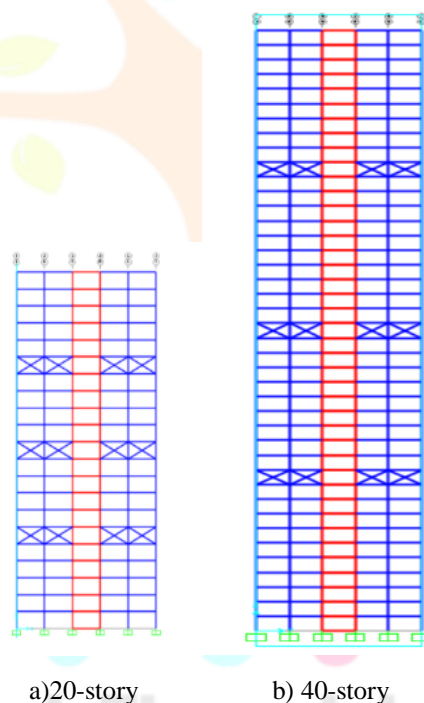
2D Framed Structure With X-type Braced Concrete Outrigger
